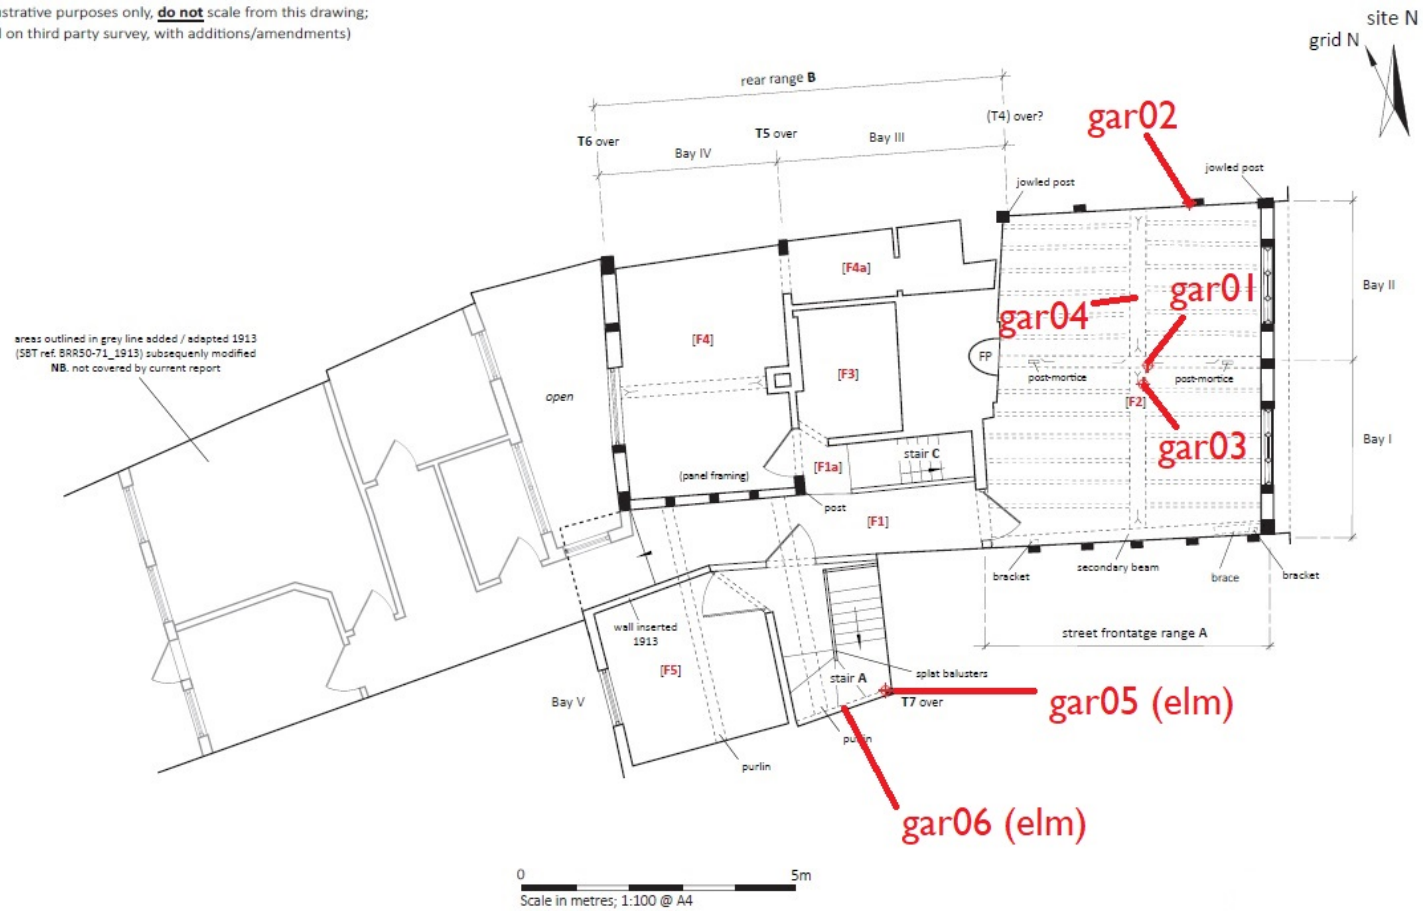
First-floor plan showing the approximate positions of timbers sampled for dendrochronology (adapted from an original drawing by Ric Tyler 2022)
